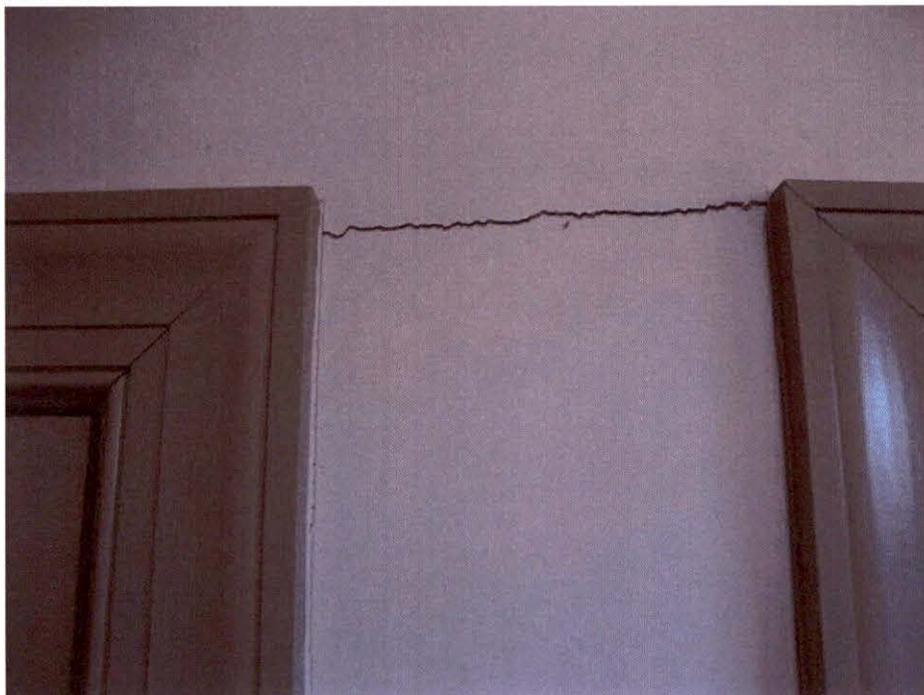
Cracks in drywall due to settlement at 921 Capital Landing Road.
